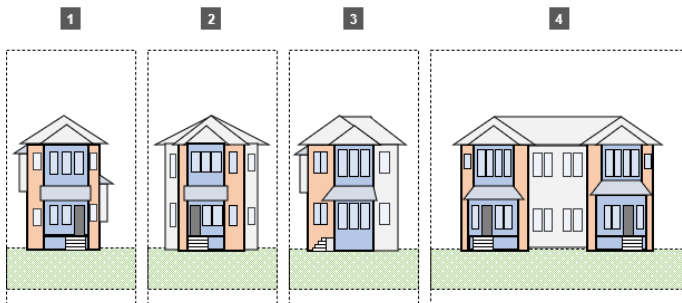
Front Building Volume & Front Projection (Elevation View)
